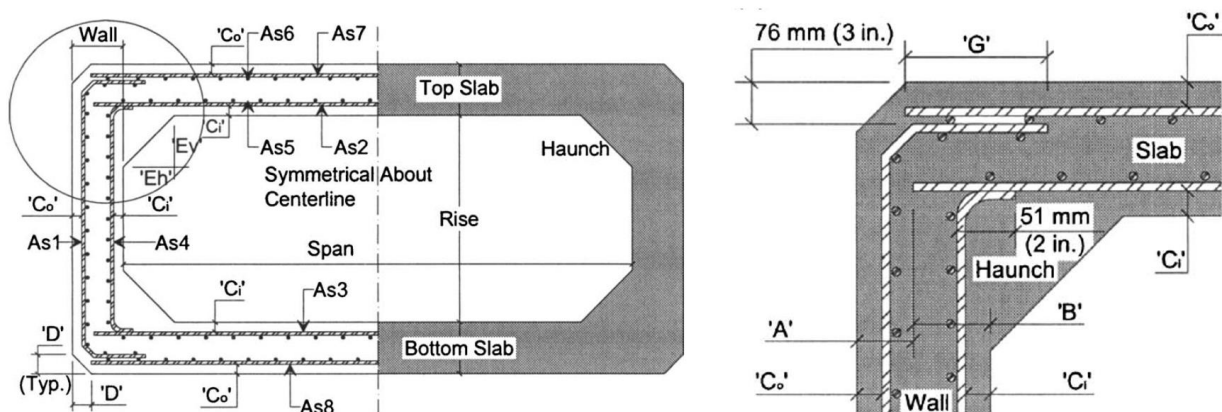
Typical cross-section of box culvert (left) and detail of reinforcement at haunch (right)
